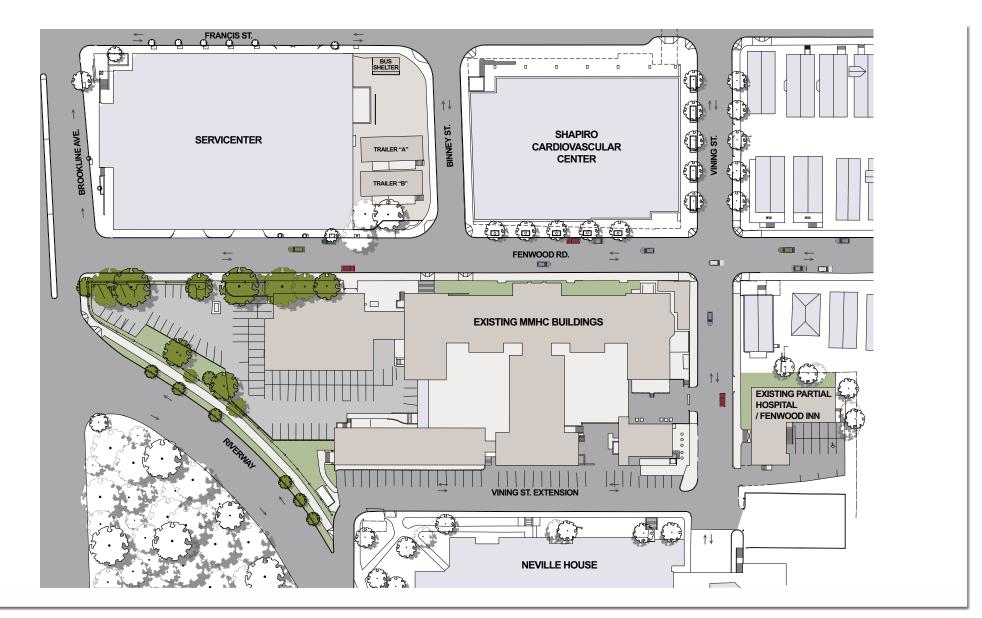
Existing Site Plan The Project comprises four distinct buildings as shown in Figure 1-3:
